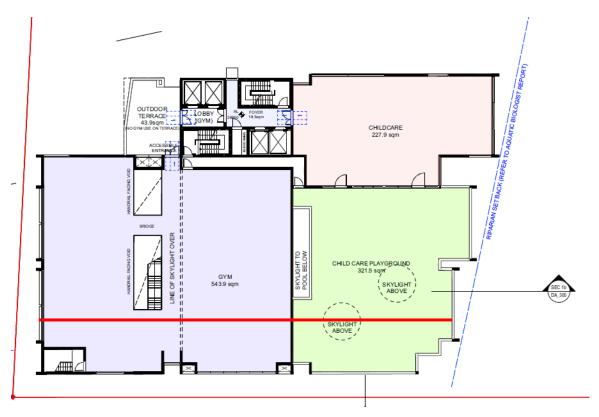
Lot 1 Level 3 Floor Plan (Source: Drawing No. DA\_106 – Bennett Murada Architects)
